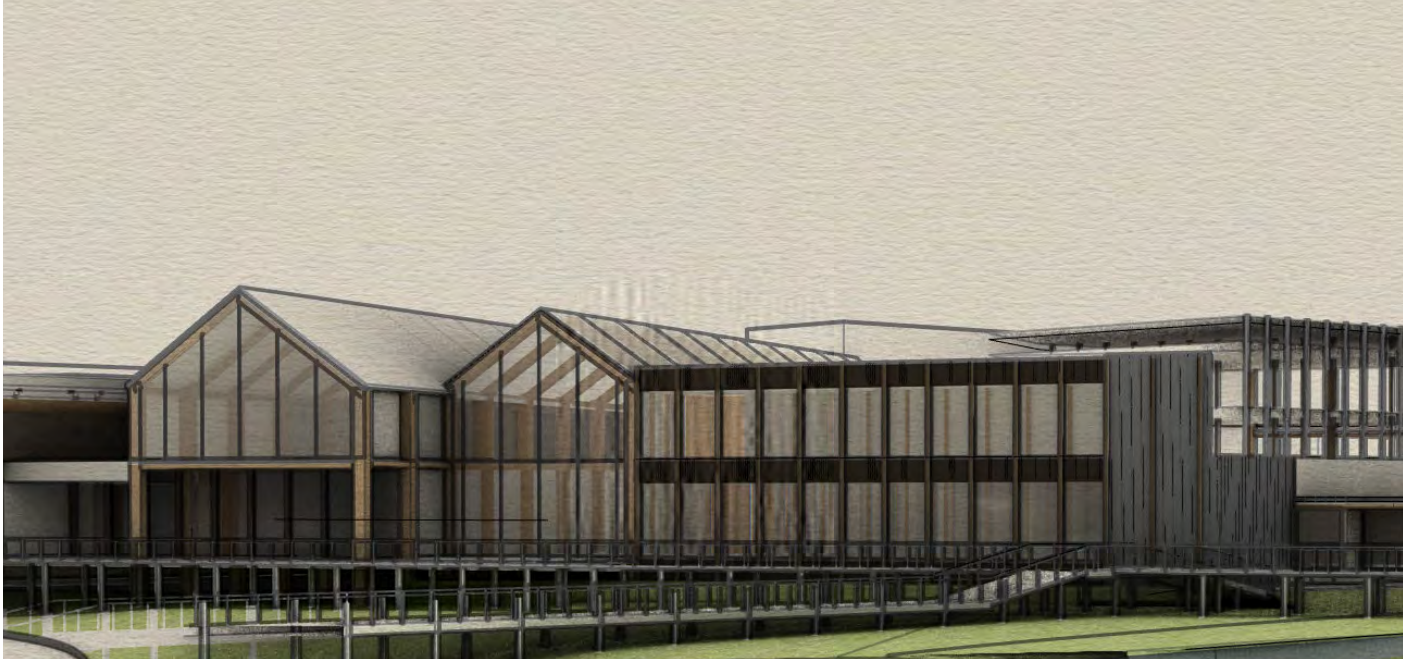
Looking back from the pier towards the new waterfront-facing facade of the PCC building.
